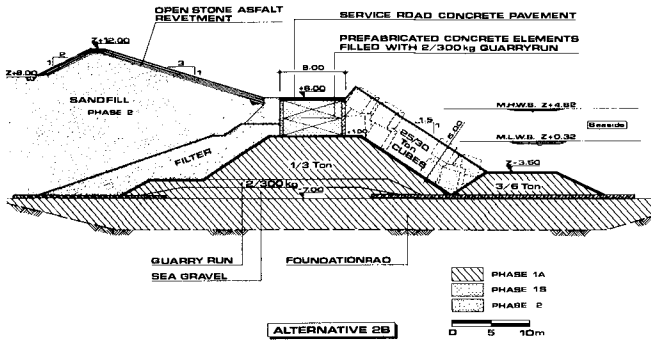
Development of design : rubble-mound breakwater alternative 2b - core built by dumping barges
